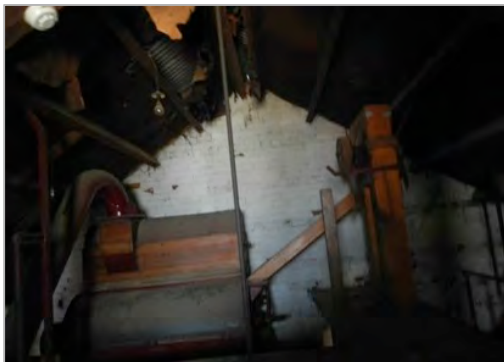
Mill building—second floor gable wall to the east (© Kasiannan, 2015)
